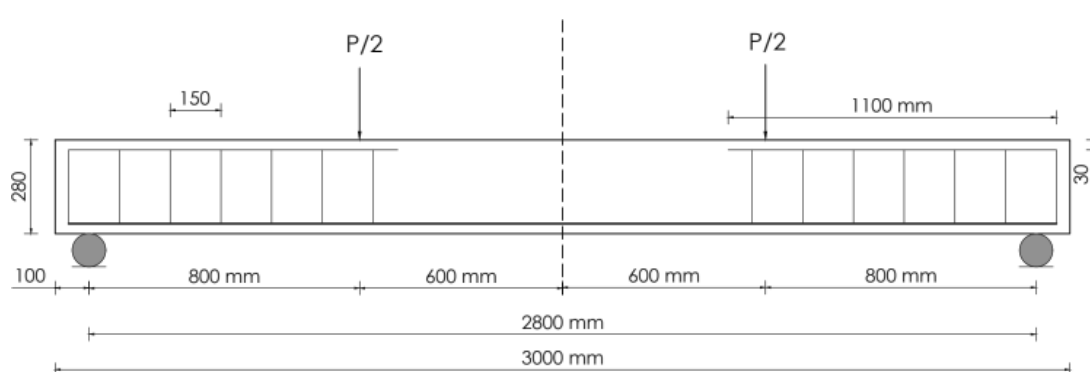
Longitudinal Profile of Reinforced Control Beam used
